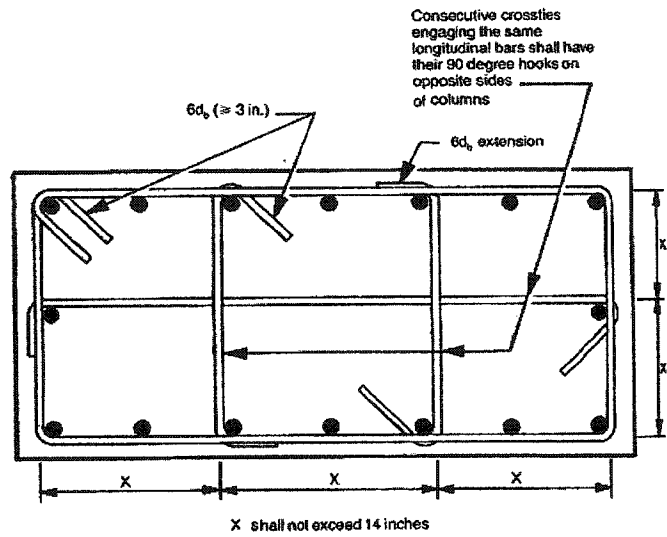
Detailing requirements in ACI 318-2002 Sec. 21.4.4
